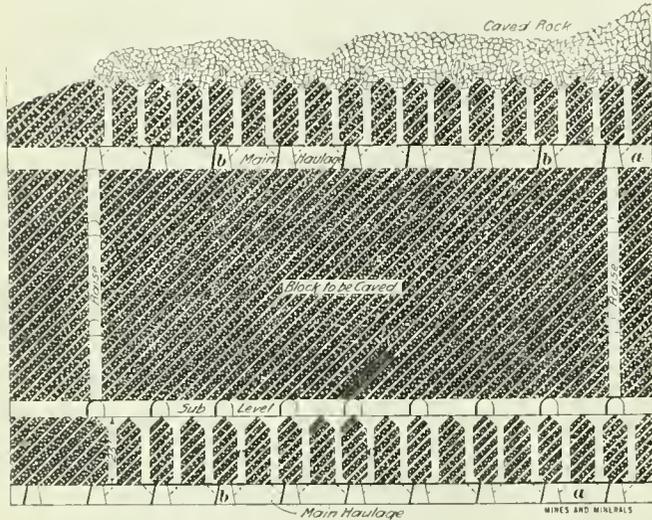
LONGITUDINAL SECTION, BLOCK CAVING SYSTEM
